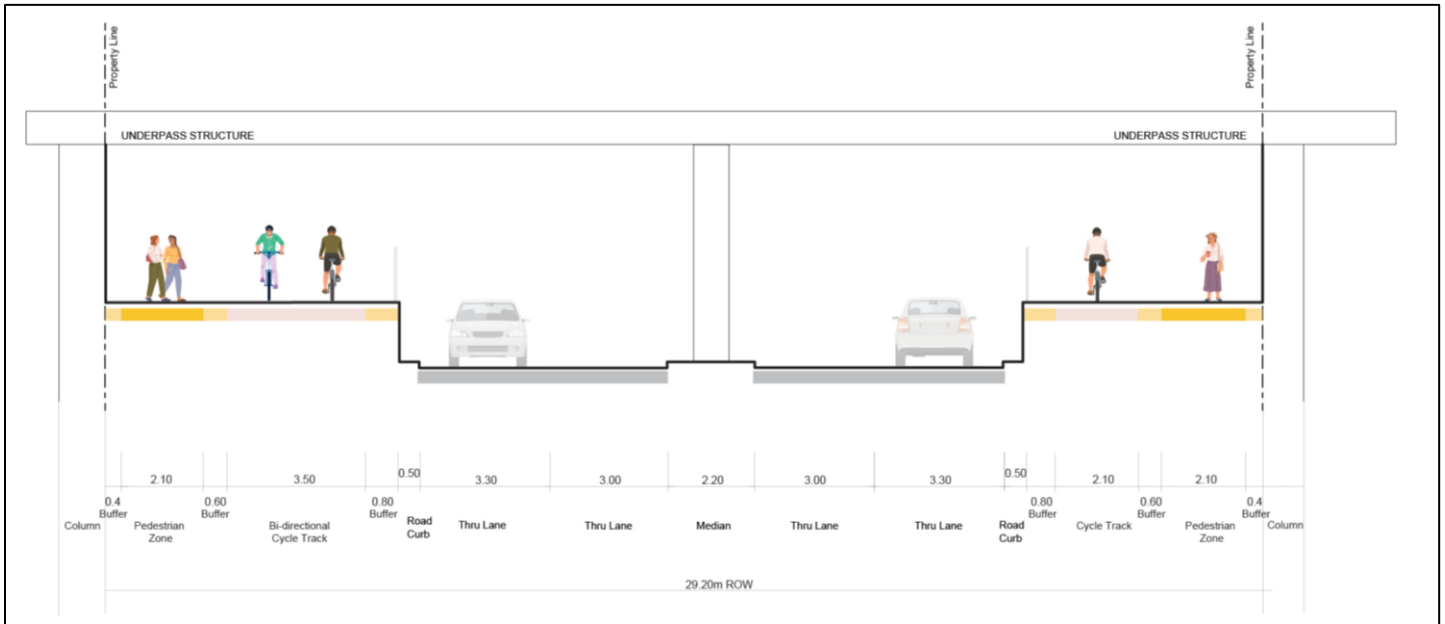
Northern Street (Underpass) Cross-Section – Option 1
